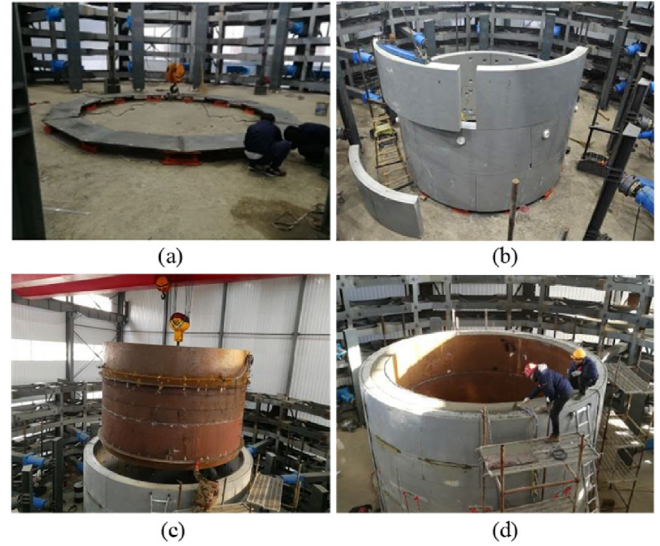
Full-scale loading test set-up: (a) Movable plate base, (b) segmental ring assembly, (c) steel tube installation, and (d) self-compaction concrete pouring.
